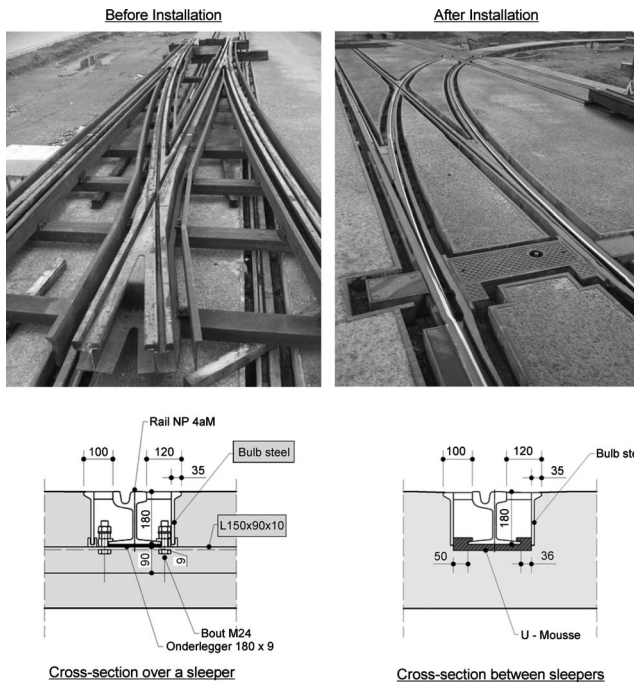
Hybrid (continuous and discrete) rail support concept (developed by Frateur de Pourq) before and after installation, along with drawings of typical rail cross sections
